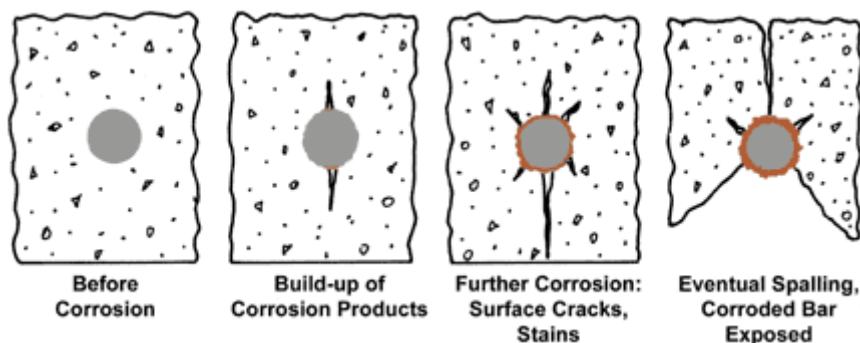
Cracking and Spalling of Concrete Caused by Corrosion (Rourke, 2008)
